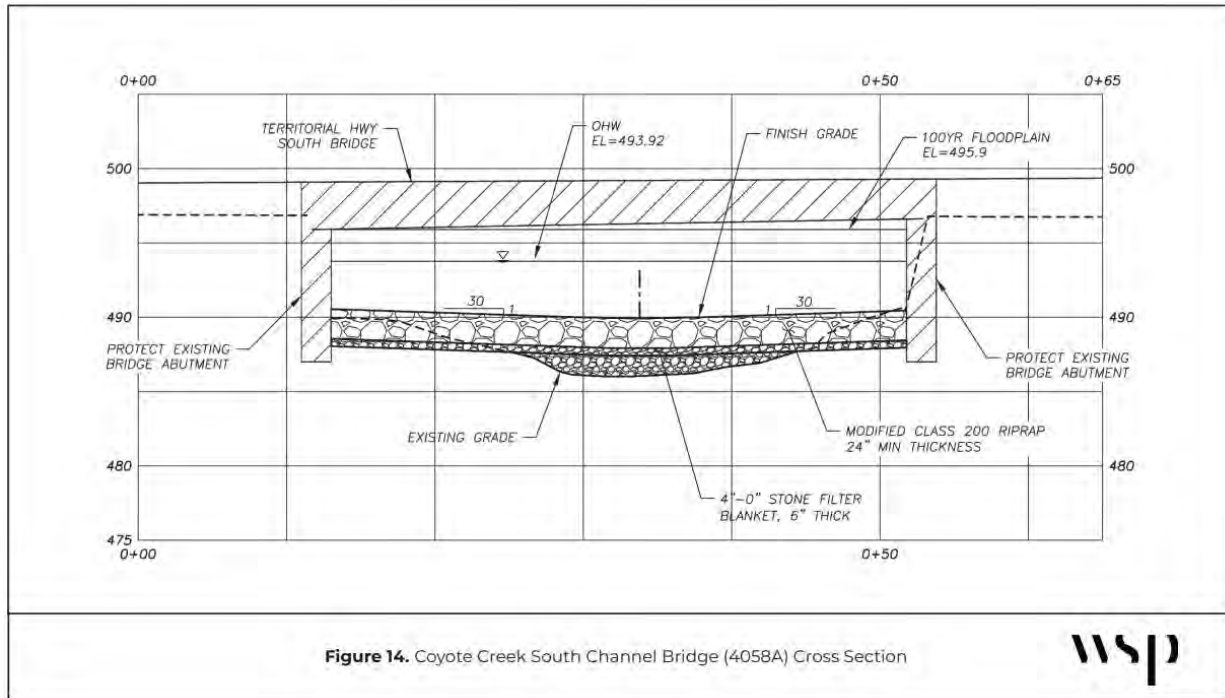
Coyote Creek South Channel Bridge (4058A) Cross Section
